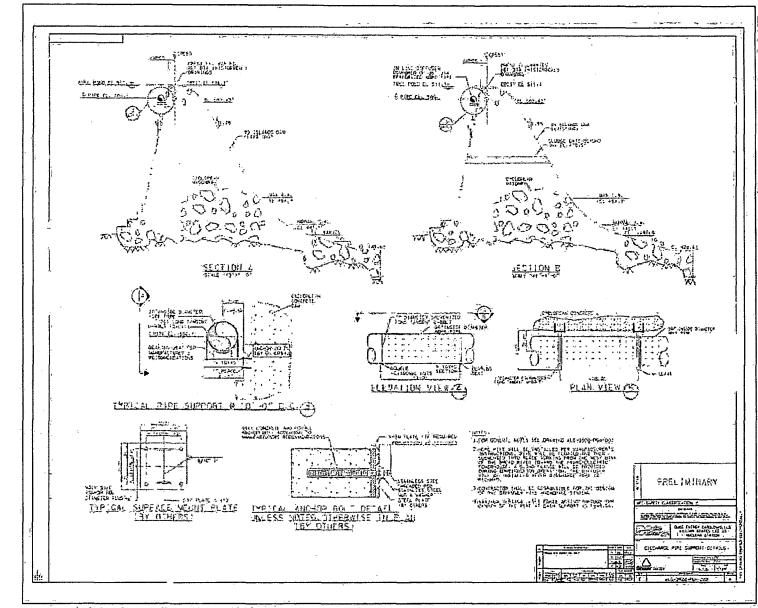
Detail plan showing the attachment of the discharge pipe to the dam.
